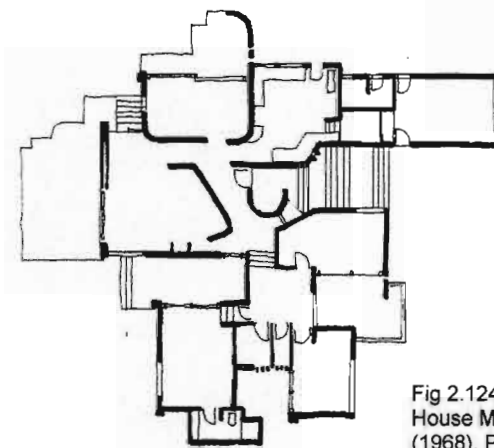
P.Mikula – House M.N. Reddy (1968). Plan.
